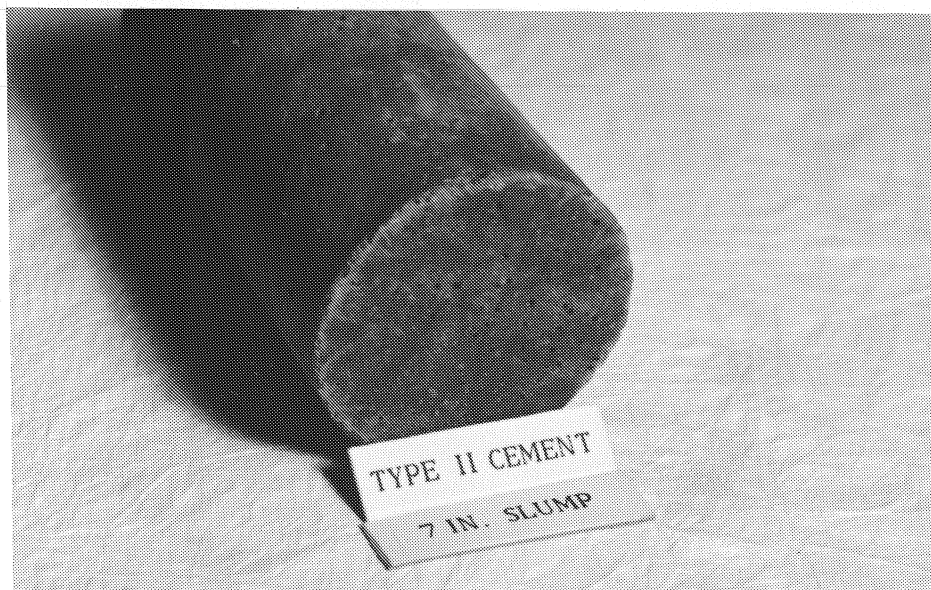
Concrete specimen containing Type II cement at 170 days.
